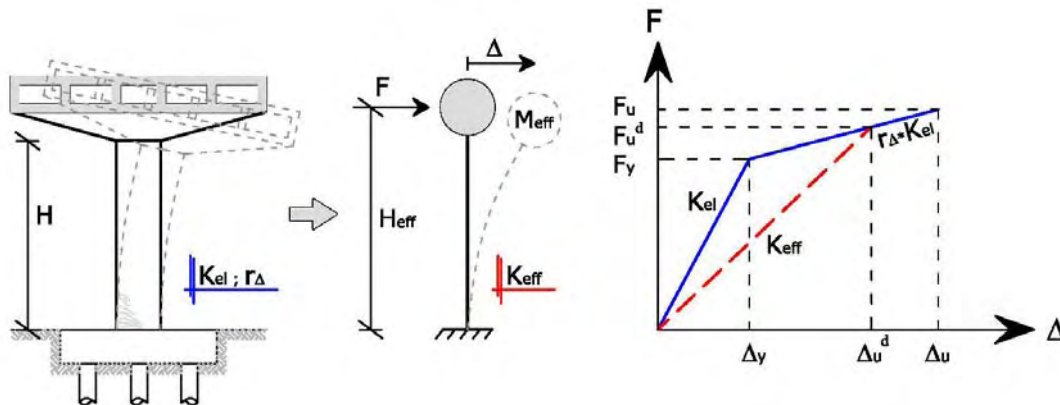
Substitute structure for a cantilever bridge pier (SDOF system)
